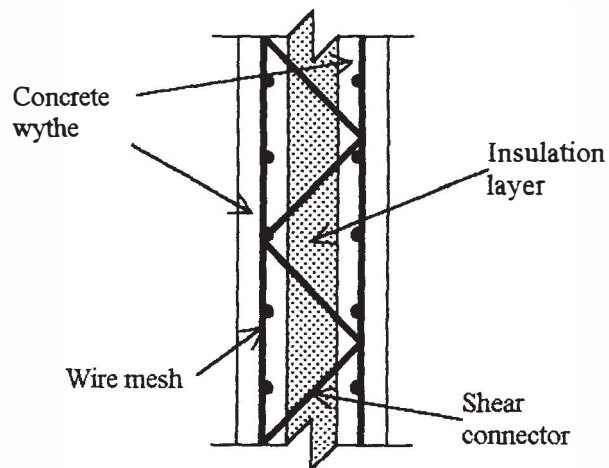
Precast Concrete Sandwich Panel with Its Components
